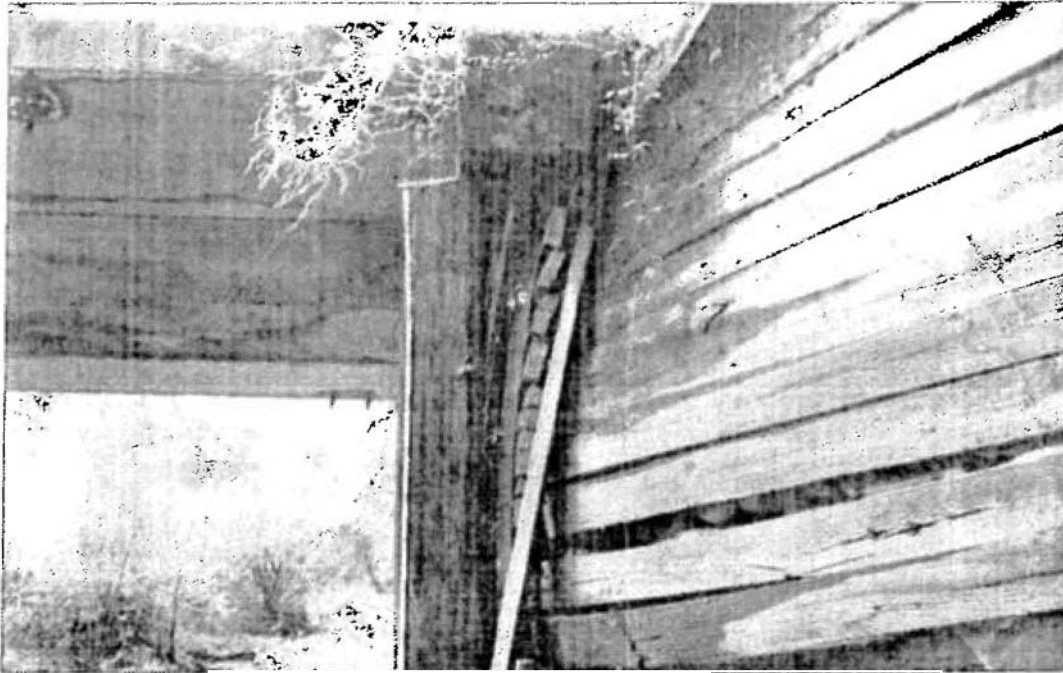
Element 476 -- Failed End Bent 5 Timber Backwall
